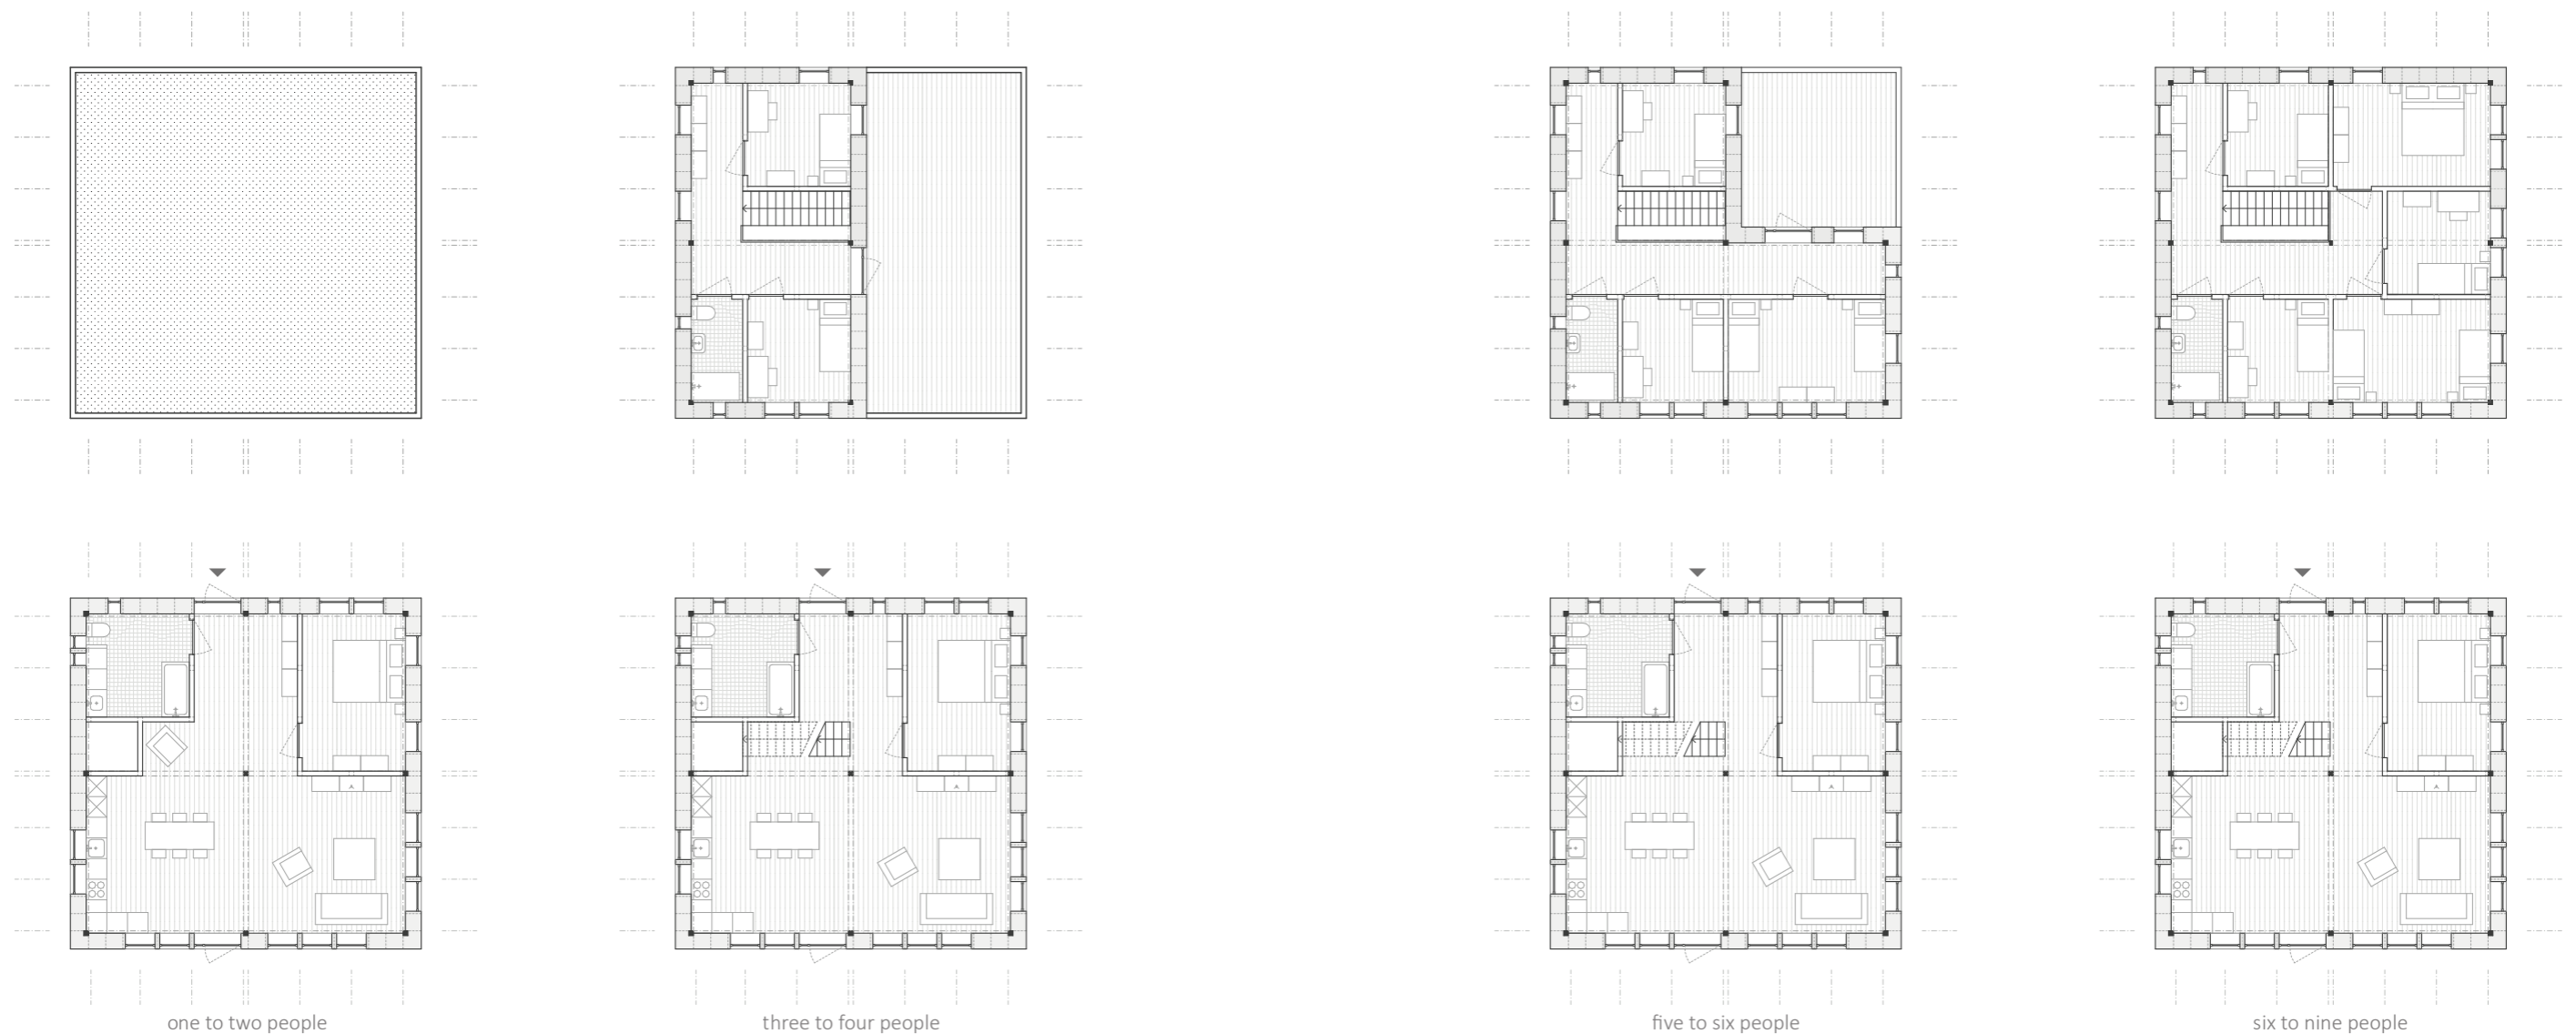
Drawing, Individual houses floorplans - 1:200. ©Personal illustration.
